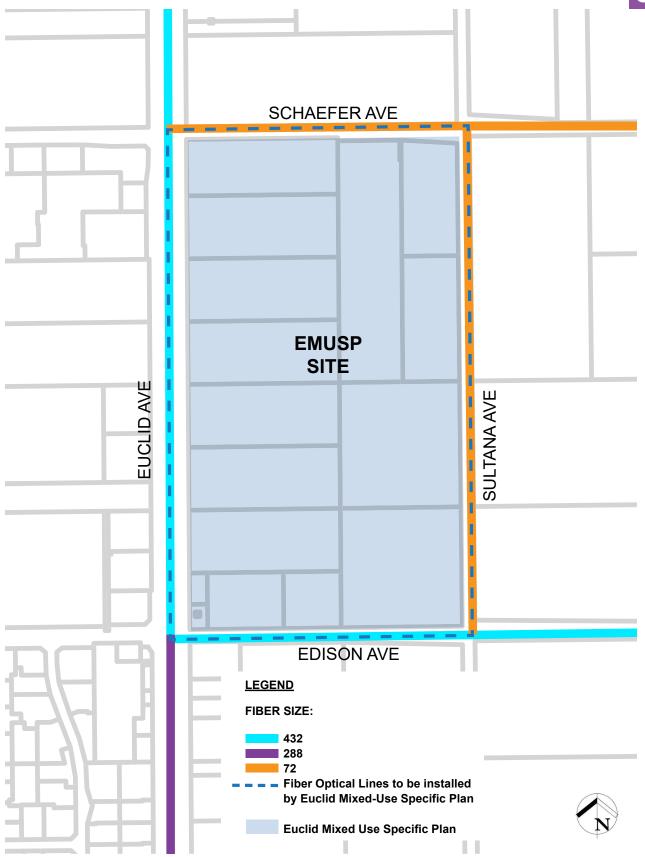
SPECIFIC PLAN FIBER OPTICAL PLAN
